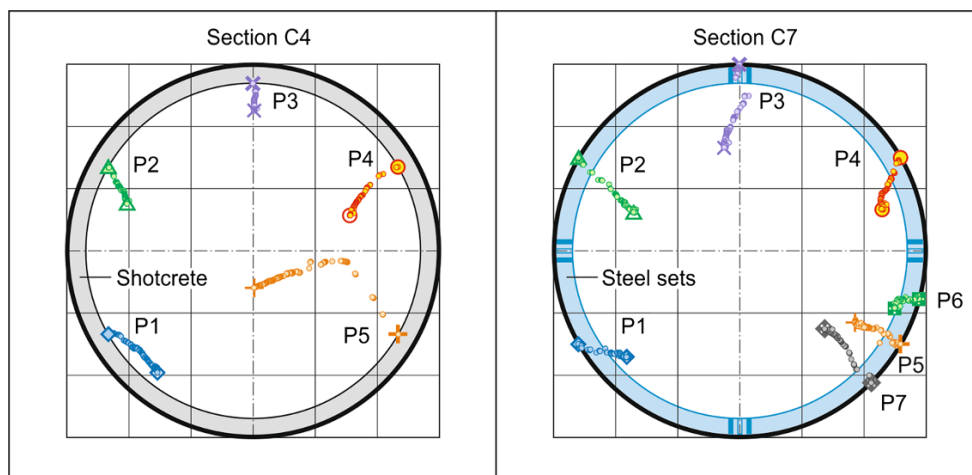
90 day tunnel wall convergences at 2 example measurement sections C4 (*left graph*) and C7 (*right graph*). C4 was located in the shotcrete section of the FE tunnel at ‘tunnel metre’ (TM) 27.6 and C7 was located at TM44.2 in the shotcrete-free section supported only by
